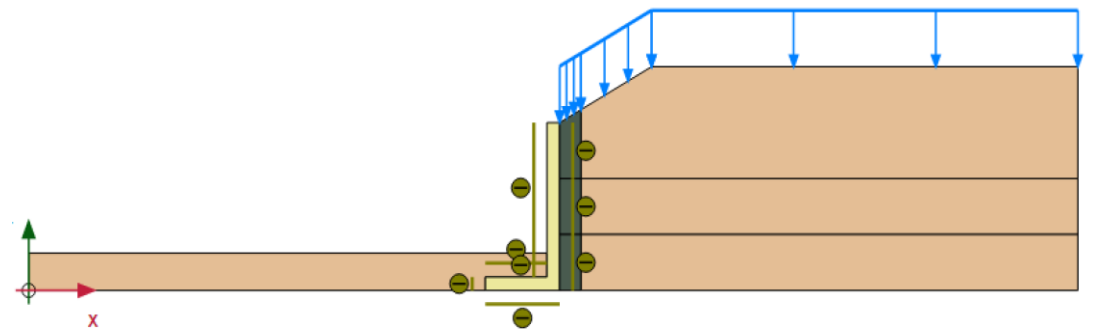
Retaining wall with backfill slope 30° and 0.6m TDA backfill
